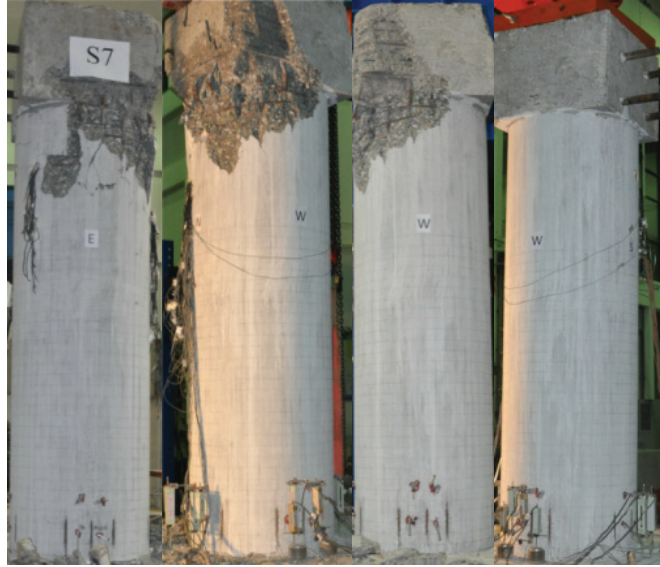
Top pier concrete spalling area of specimen S7.
